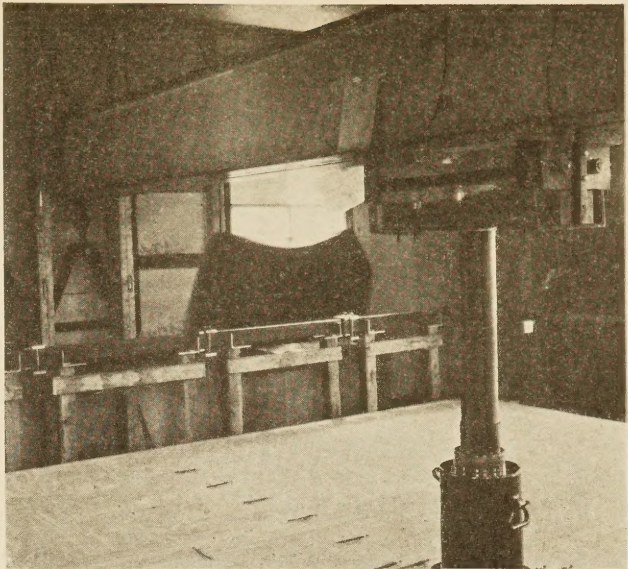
APPARATUS USED IN TESTING SLABS. THE DEVICE USED TO DETERMINE I-BEAM REACTIONS CAN BE SEEN AGAINST THE WALL
